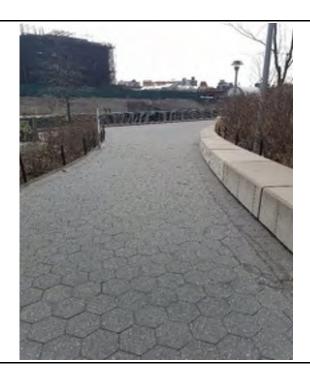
Paved esplanade area, facing southeast. 27 February 2019.
